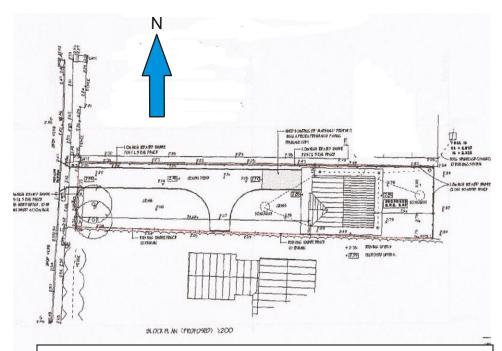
Block Plan Showing the Layout of the Proposed Development at an original scale of scale 1:200, (not to scale), (extract from Architects plan).
